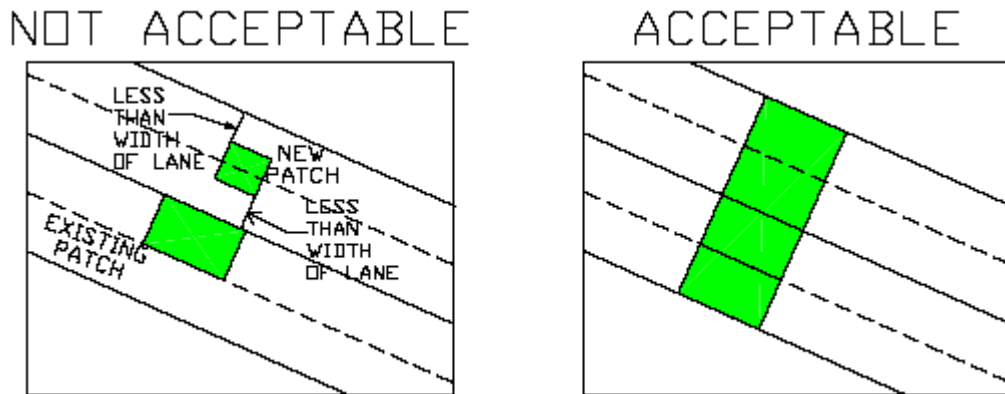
Example 3: Do not leave strips of pavement less than one-half lane in width.
